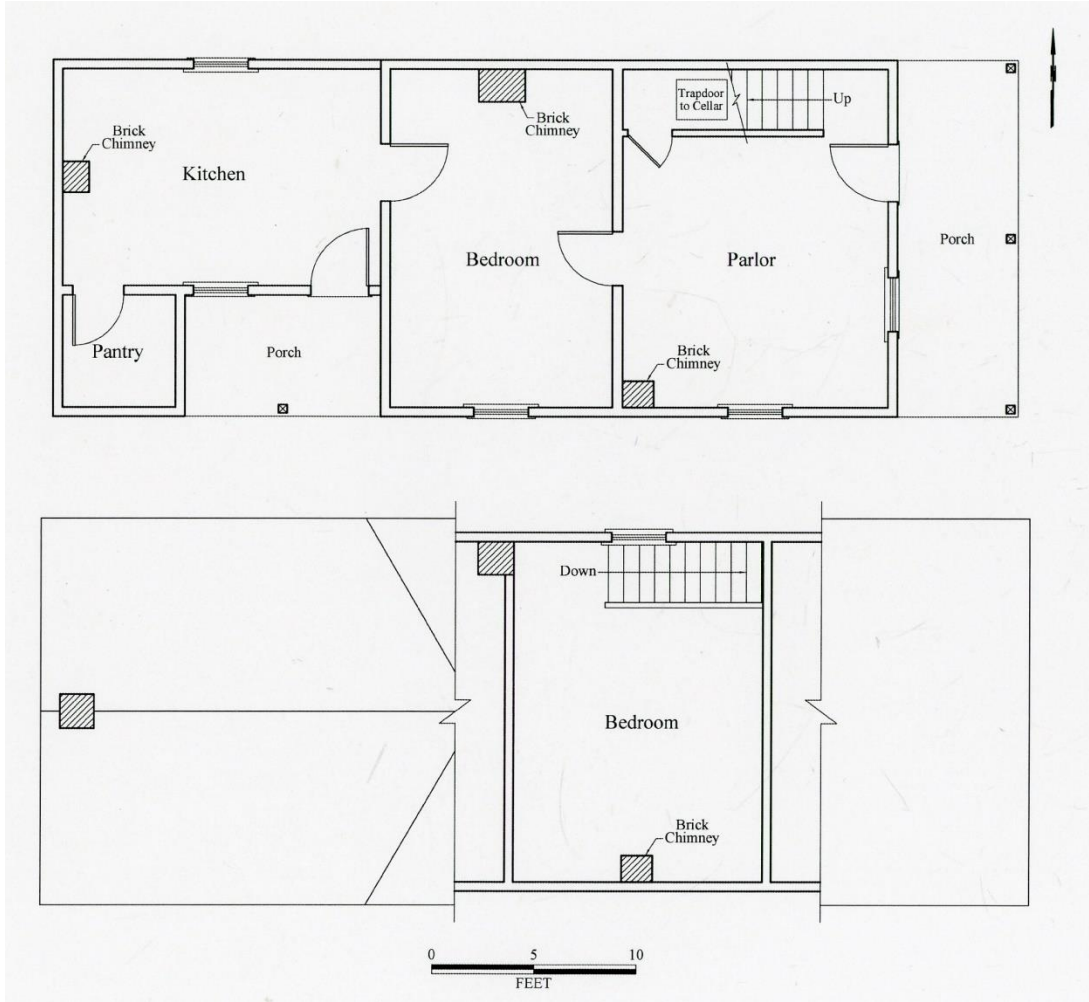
Conjectural first and second floor plans of House E, circa 1870 (after construction of rear addition).
